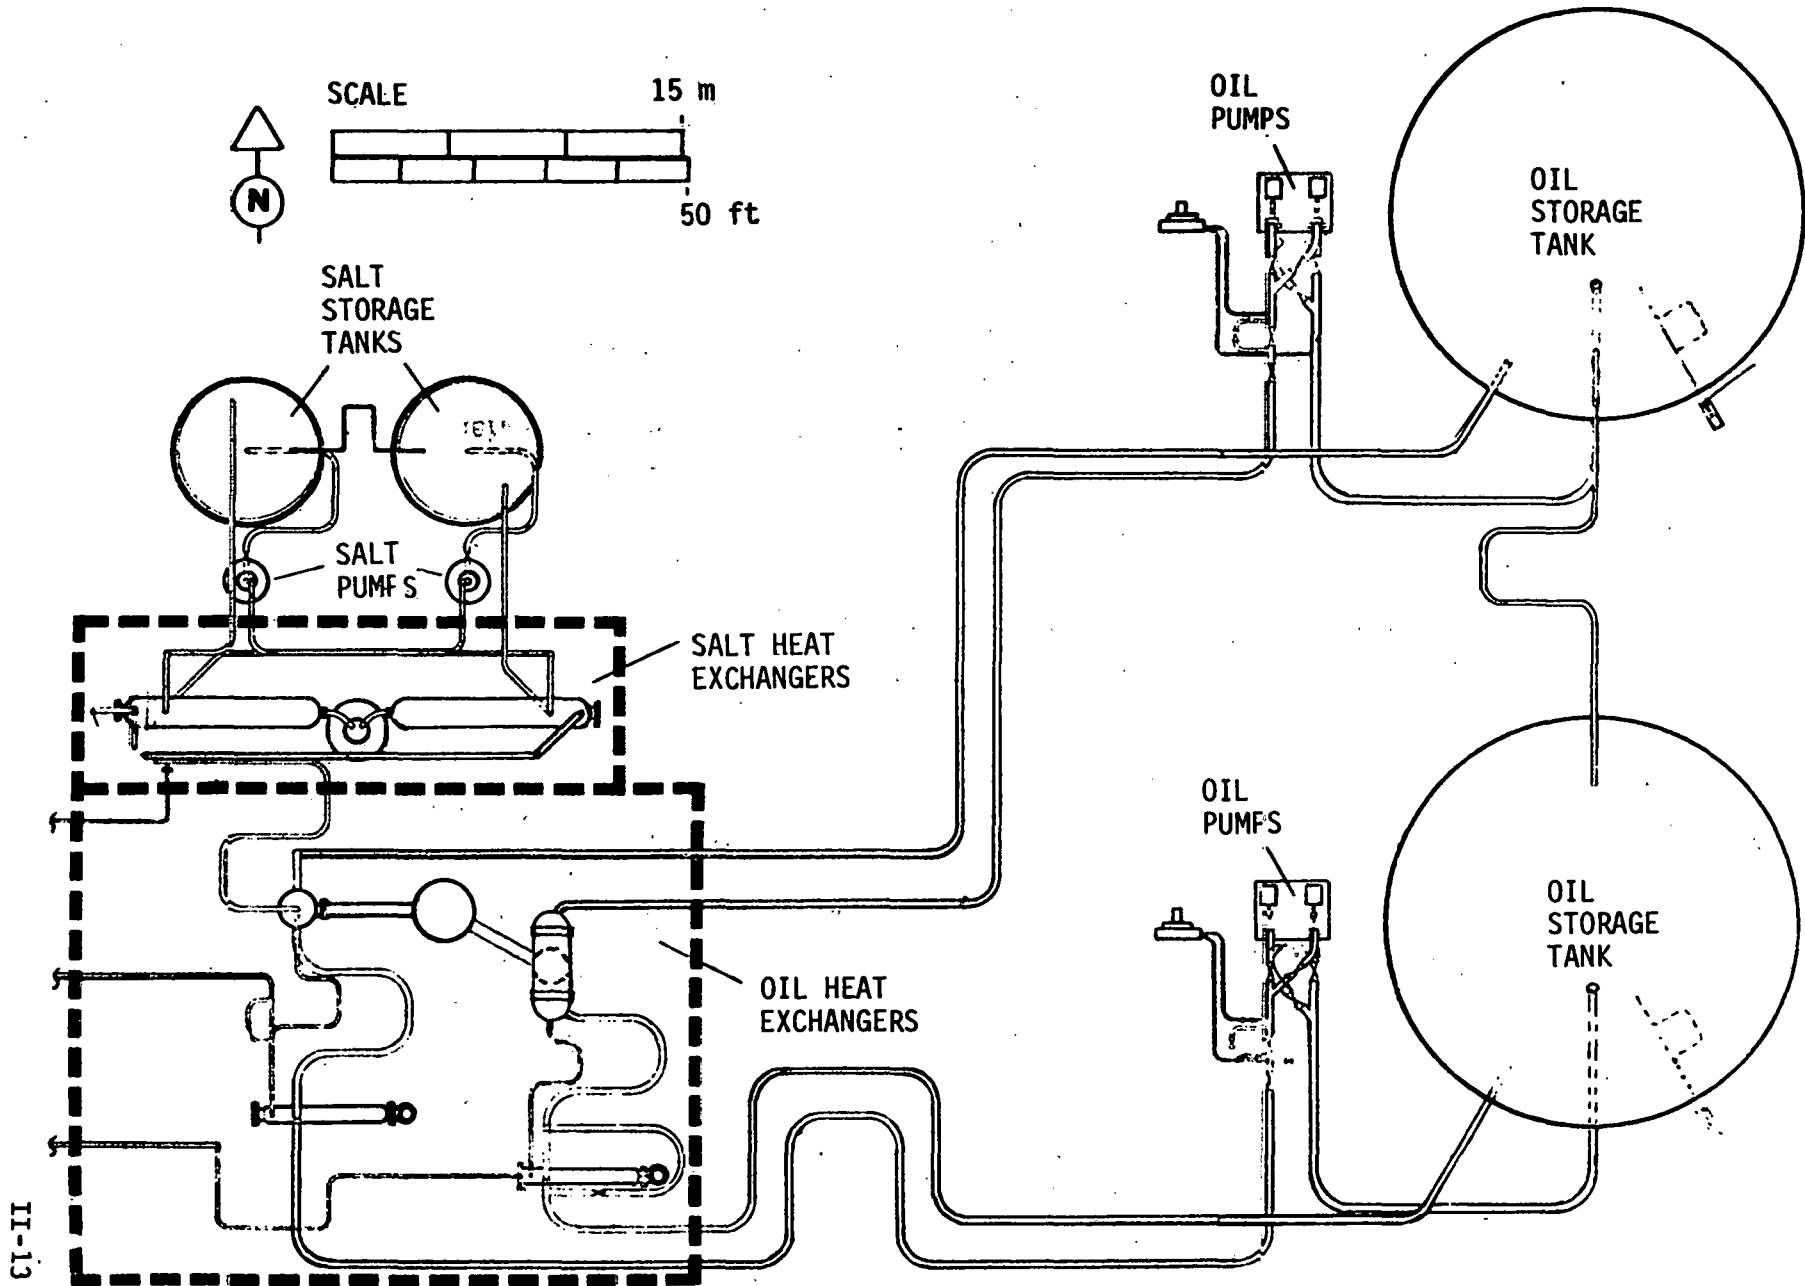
Thermal Storage Subsystem - Plan View of Components
